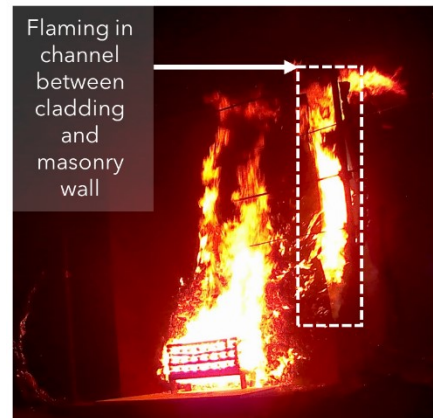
Photo of an experiment with HPL (C), Phenolic Foam (C) insulation, and no cavity. Flames have rapidly spread along the channel between the cladding and the masonry wall formed by the insulation not being flush with the cladding.
